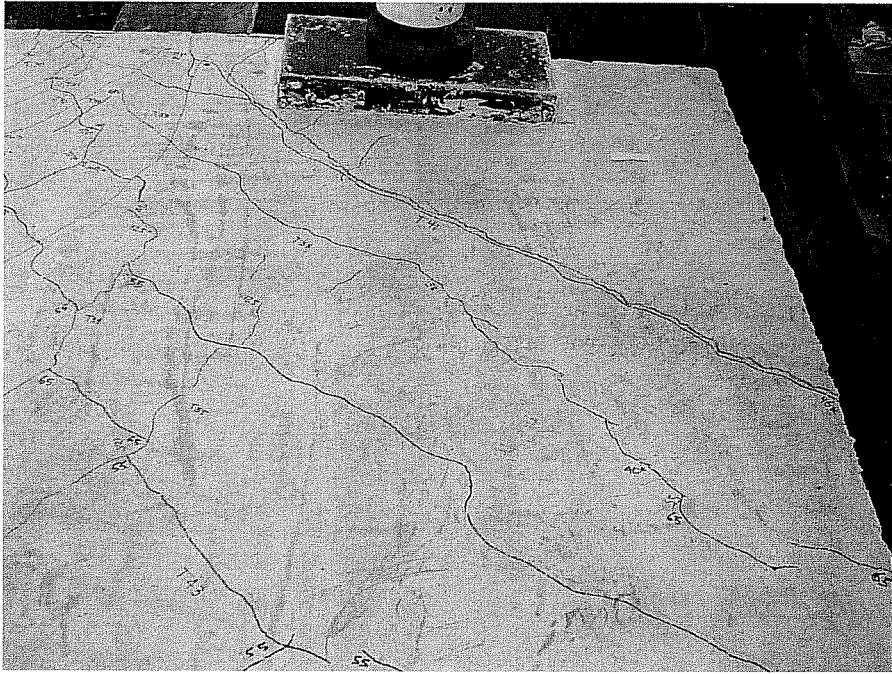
Failure of Overhang Test Area 4, top view, facing north
